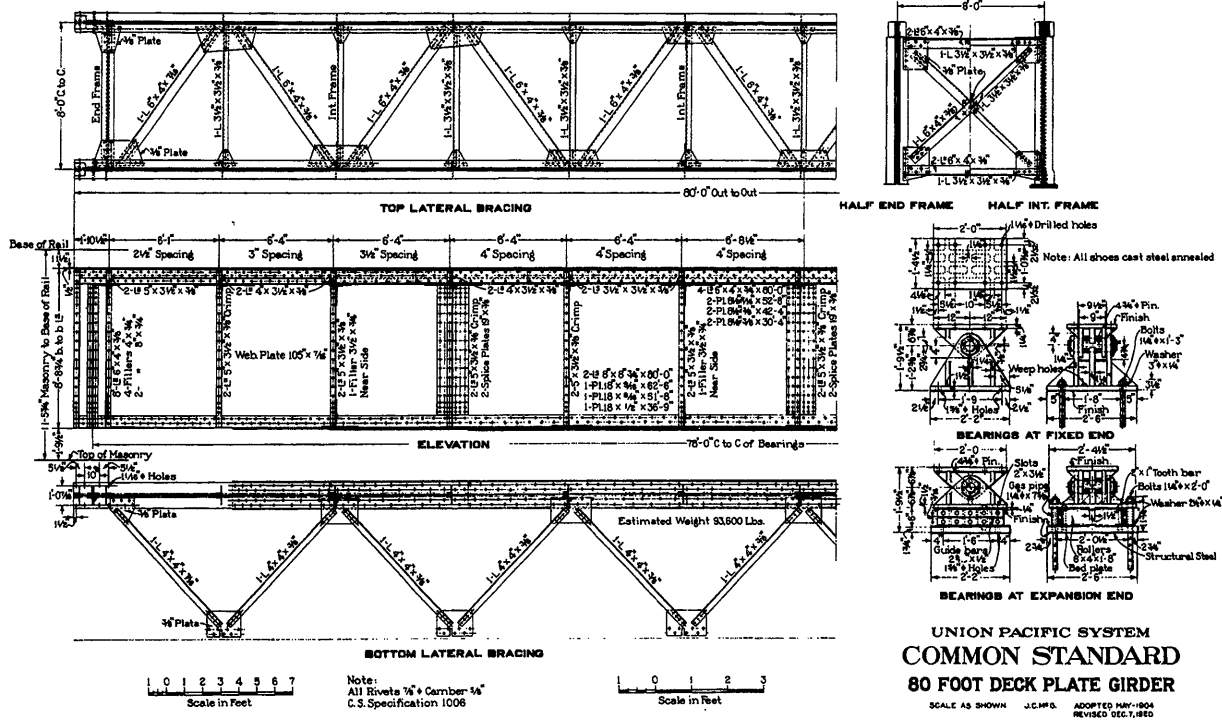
80-foot deck plate girder, from Union Pacific standards
